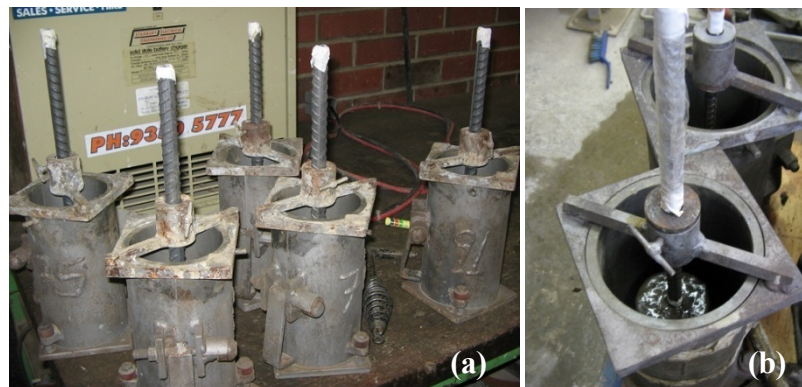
Lollipop sample type moulds: (a) ACT specimens, (b) MIC specimens.
